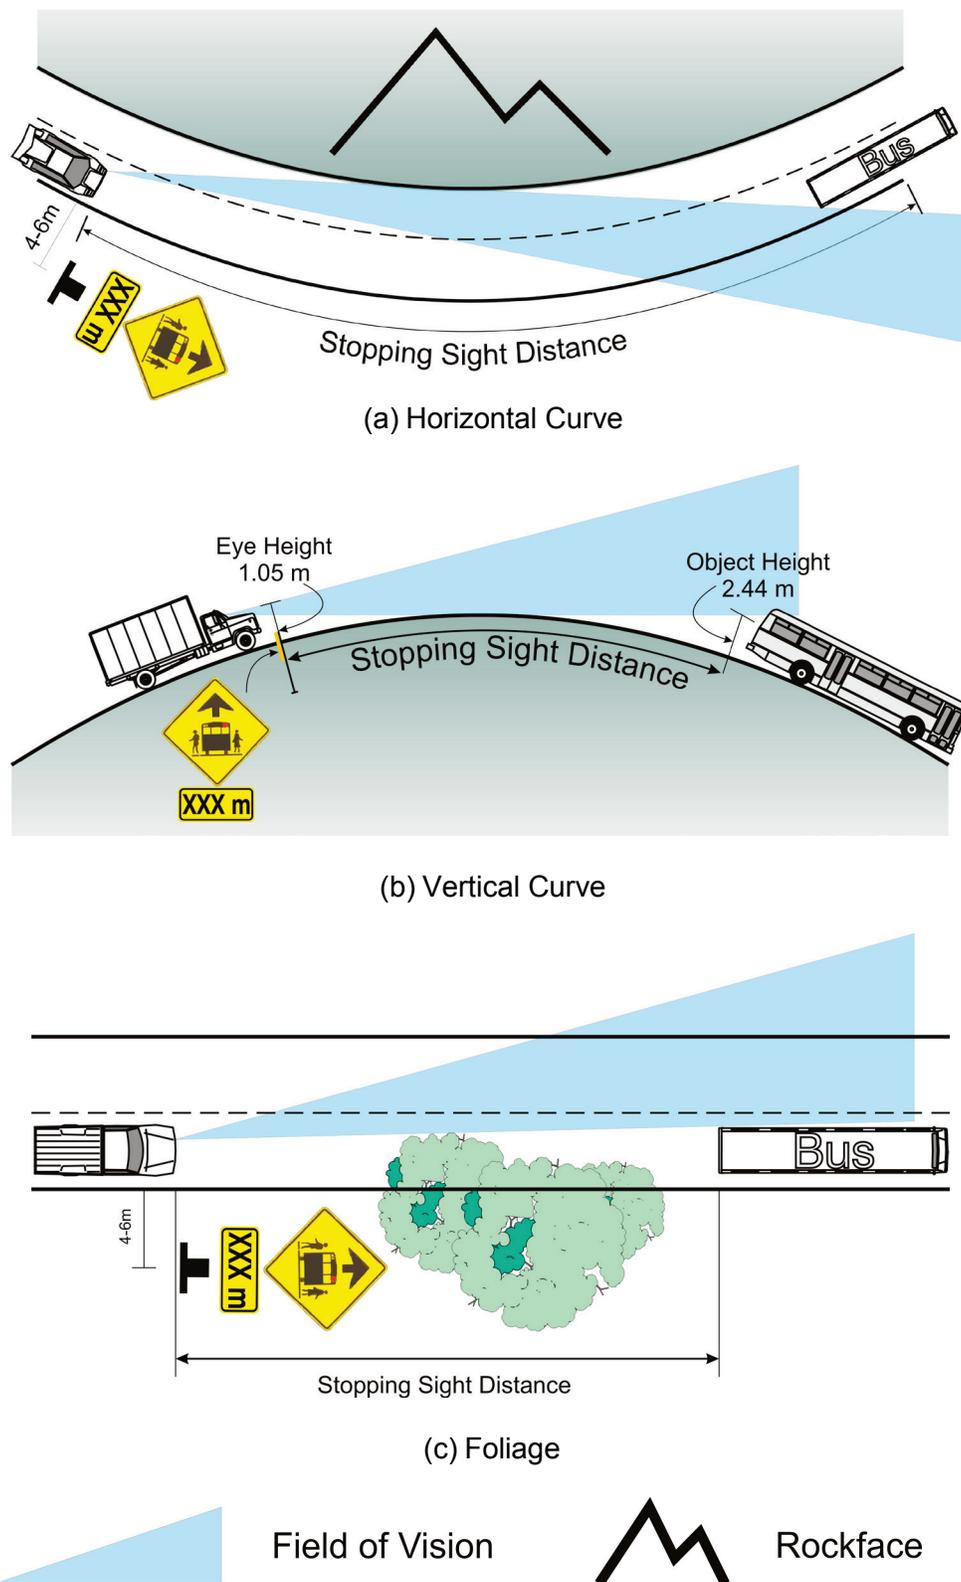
STANDARD LAYOUTS FOR WC-9 SIGN PLACEMENT
